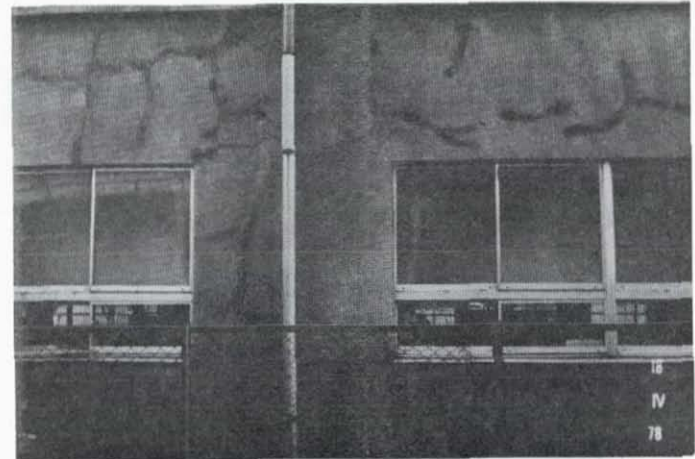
BENDING CRACKS IN EXTERIOR WALLS (PRESCHOOL HOUSE, ONE-STORY, INATORI-REGION)
